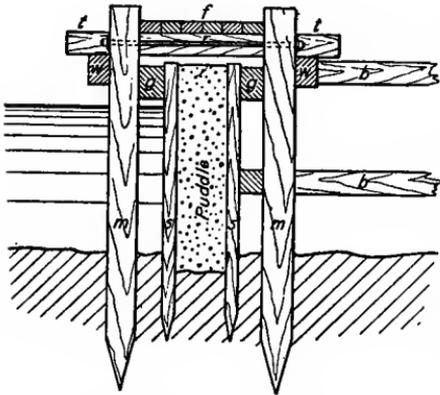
PUDDLE-WALL COFFER-DAM.
